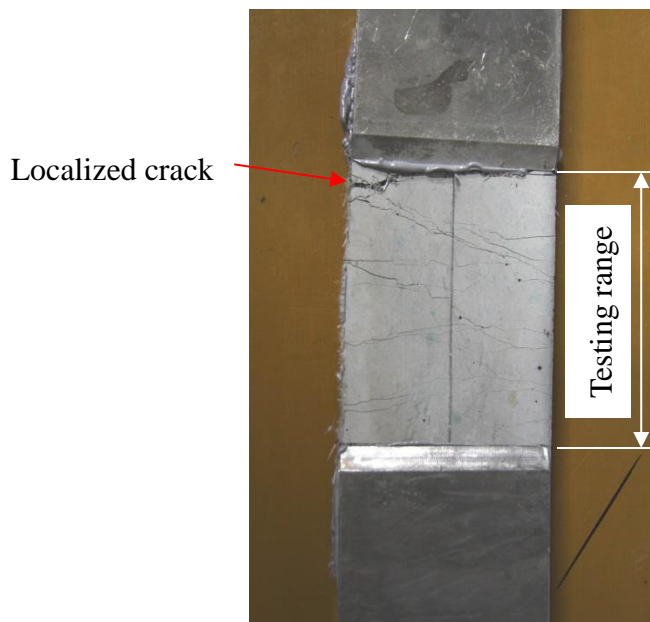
Crack pattern after the uniaxial loading tests.
